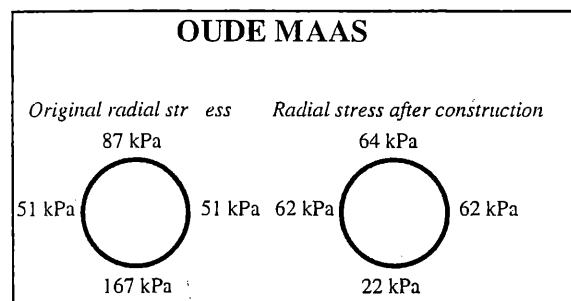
Effective radial soil stresses before and after tunnel installation at Oude Maas crossing
